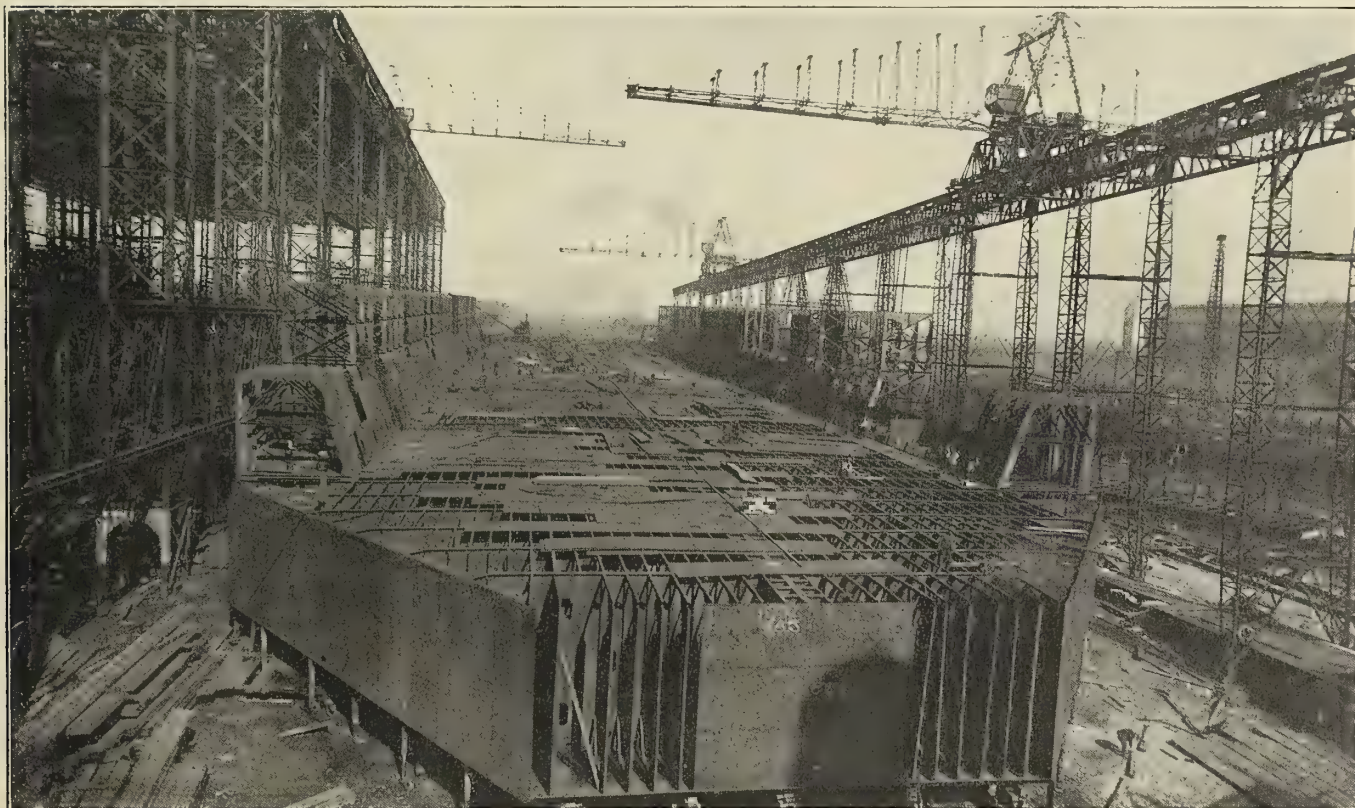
DOCK UNDER CONSTRUCTION, SHOWING SUBDIVISION OF BOTTOM PONTOON AND SIDE WALLS
